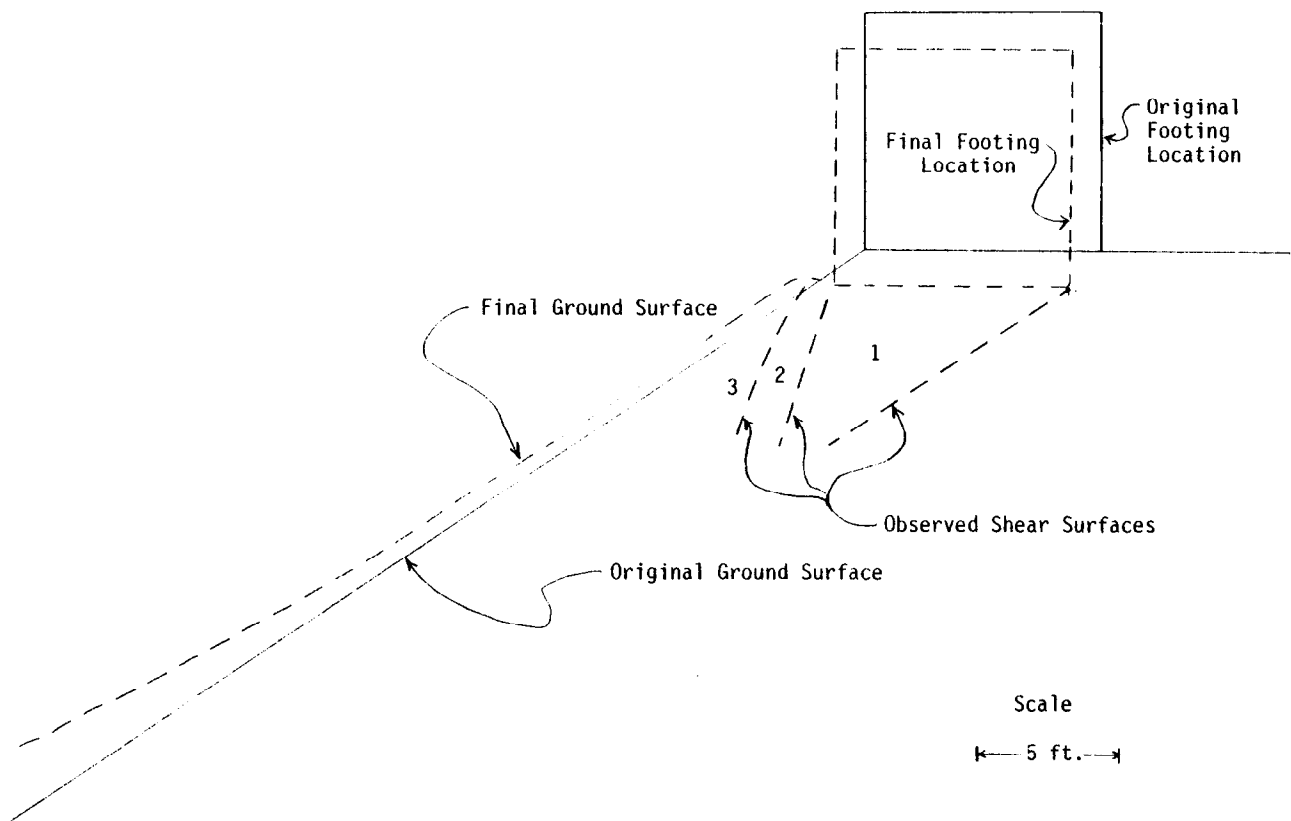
Failure mechanism interpreted from photograph of model test No. 3.
